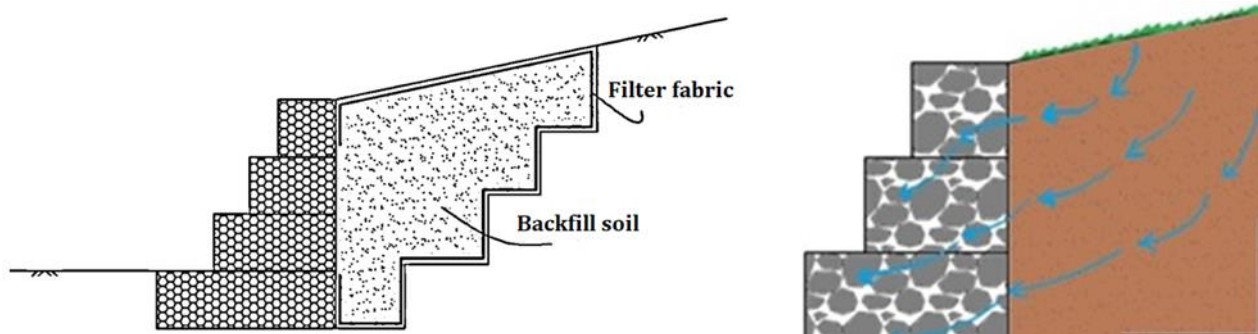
Application of filter fabric and permeability of gabion retaining wall [12-13]
